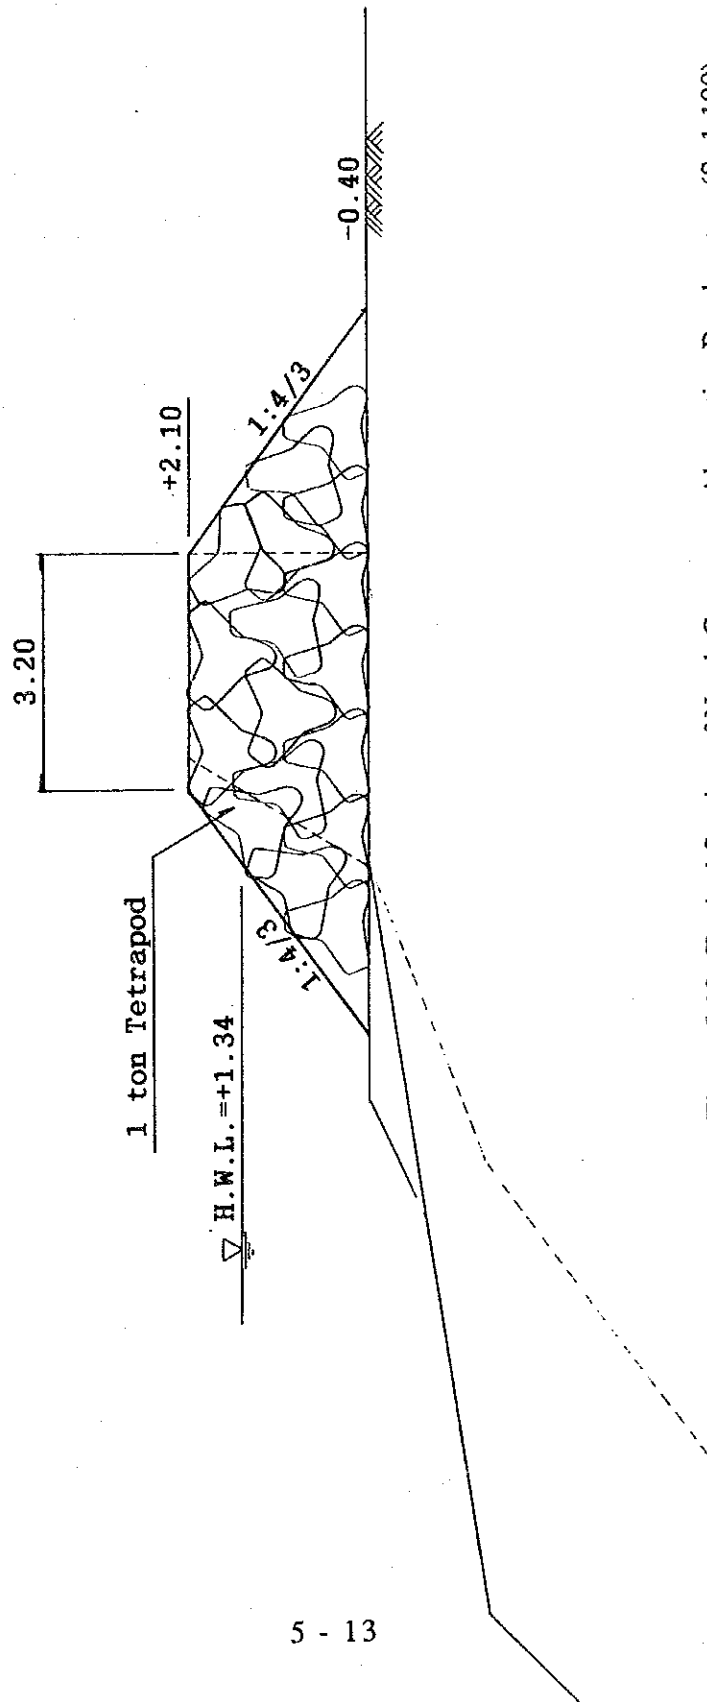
Typical Section of North Coast : Alternative Breakwater (S=1:100)
